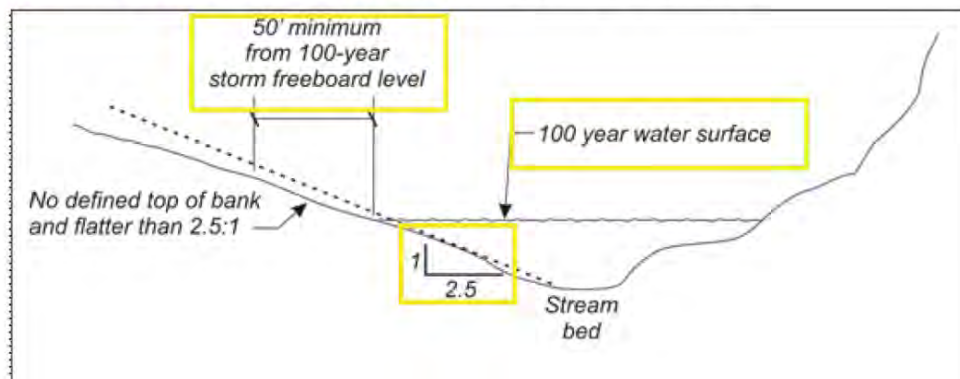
Setback without defined bank (see exceptions Section 20-30.040.D.4.)
